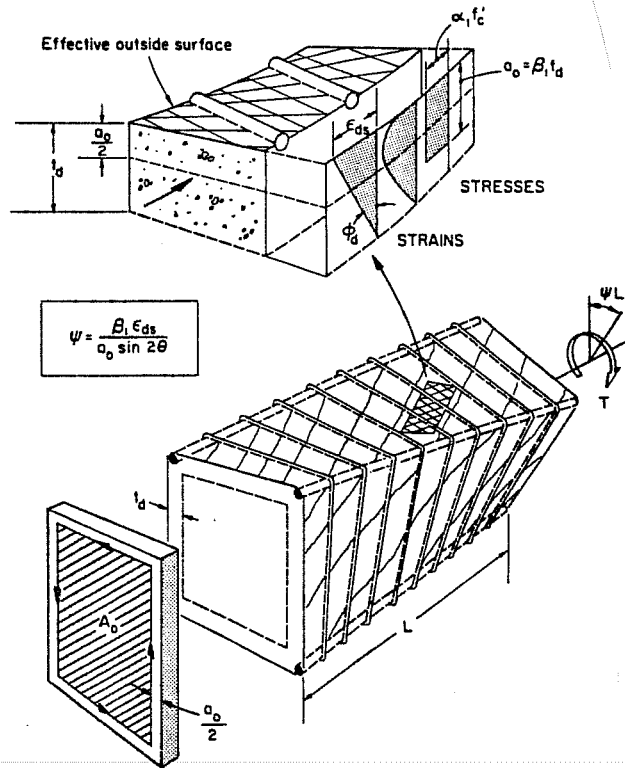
Deformed Shape of a Twisted Beam (from Ref. 14)
